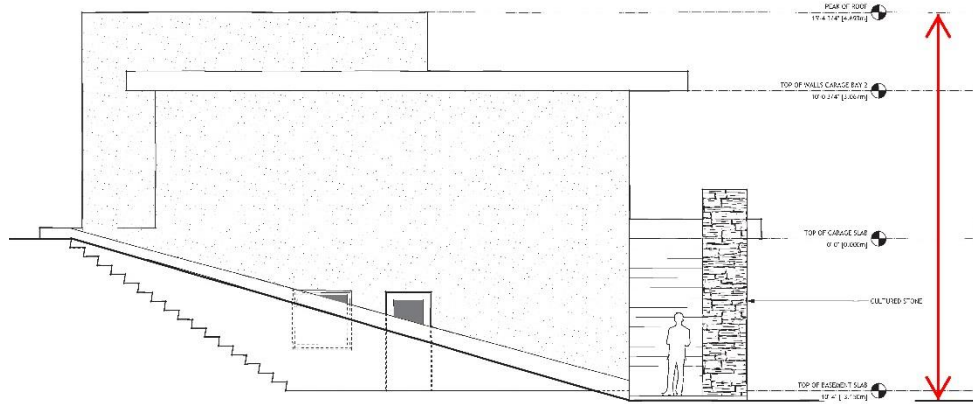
Cross Section of Proposed Carriage House showing where the 8.05m height measurement is taken; on the walkout side.
